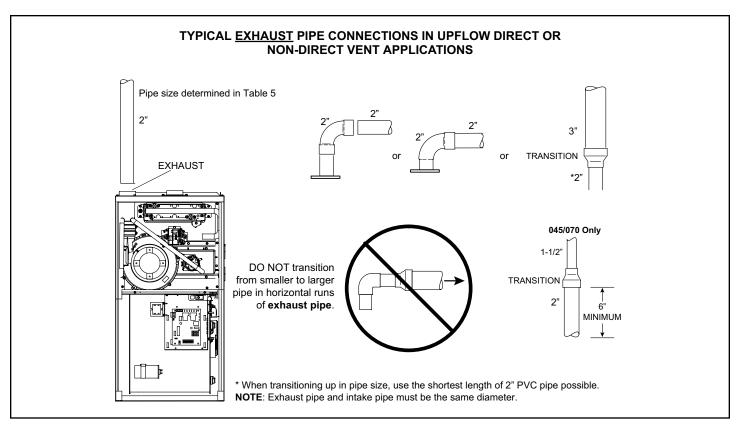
Typical Exhaust Pipe Connections in Upflow Direct or Non-Direct Vent Applications
